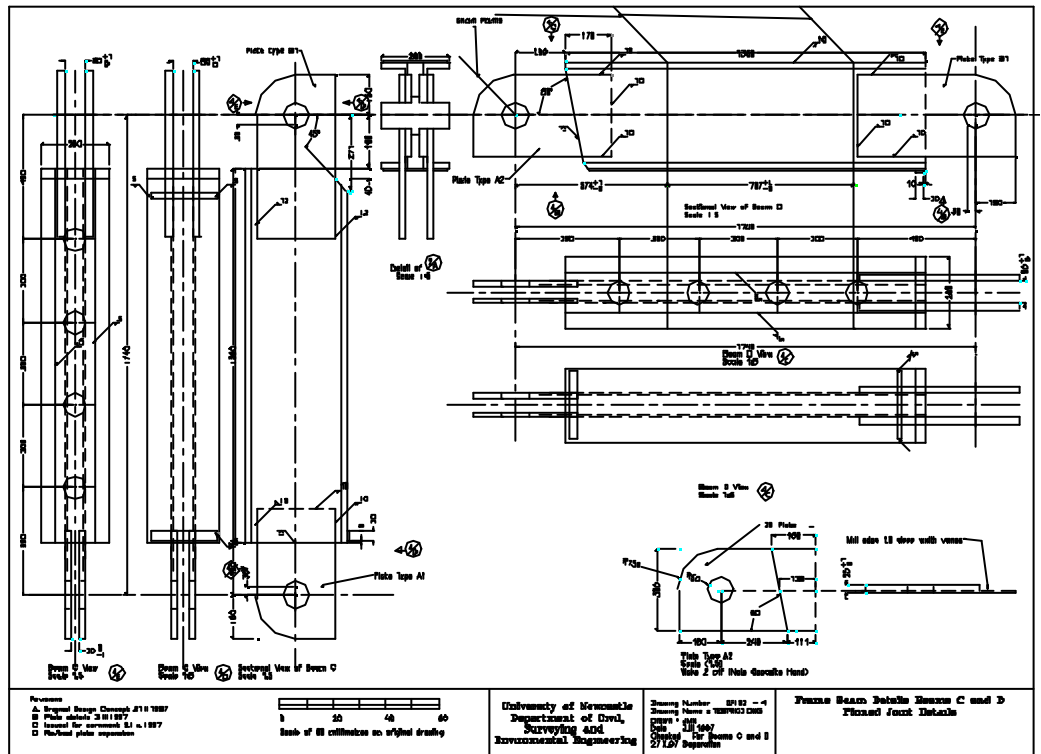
EF102 - 4 FRAME BEAM DETAILS BEAMS C AND D, JOINT DETAILS
